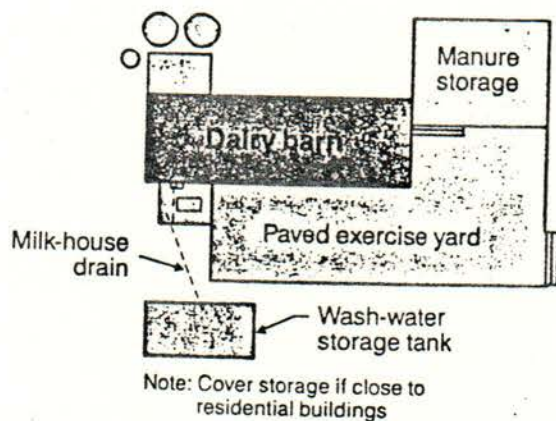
Storing Milkhouse Wastes in a Separate Storage
